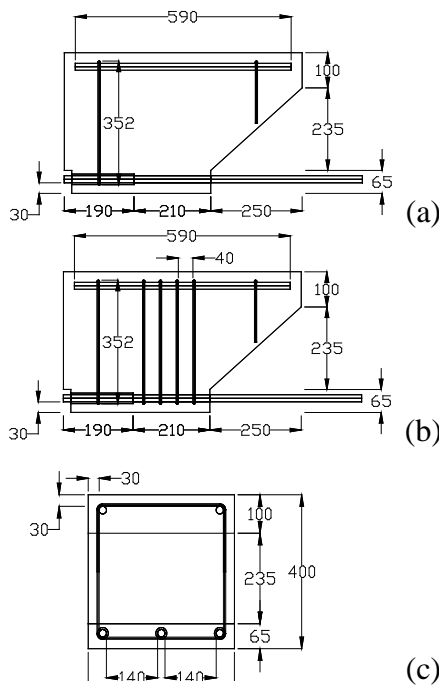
Specimen geometry and reinforcement: (a) without stirrups; (b) specimens with stirrups and (c) cross-section of all the three types of specimen. All dimensions are in mm
